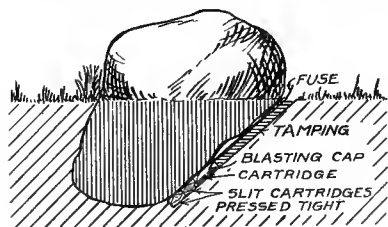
CORRECTLY PLACED CHARGE FOR A SNAKEHOLE BLAST. THE CHARGE SHOULD BE IN CONTACT WITH THE BOTTOM OF THE BOULDER
